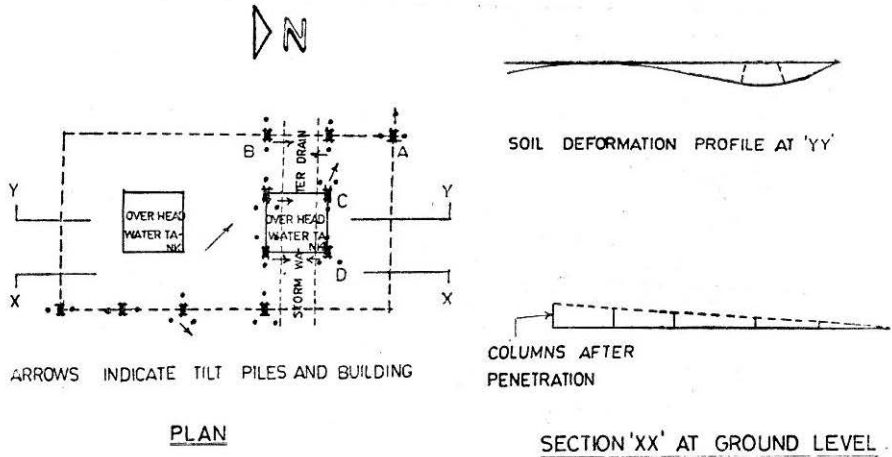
Tilt Direction of Piles and Building and Soil Deformation Profile.
